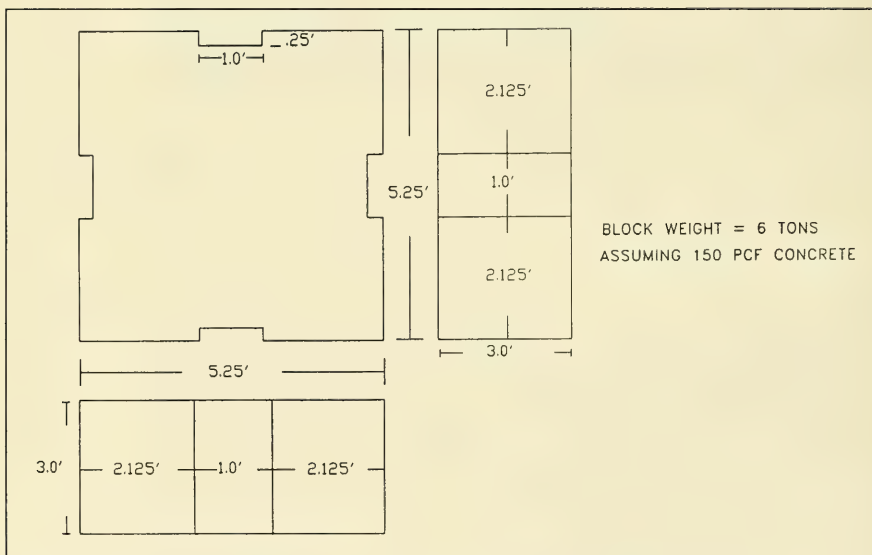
Details of modified concrete block used on Plans 6 and 6R
